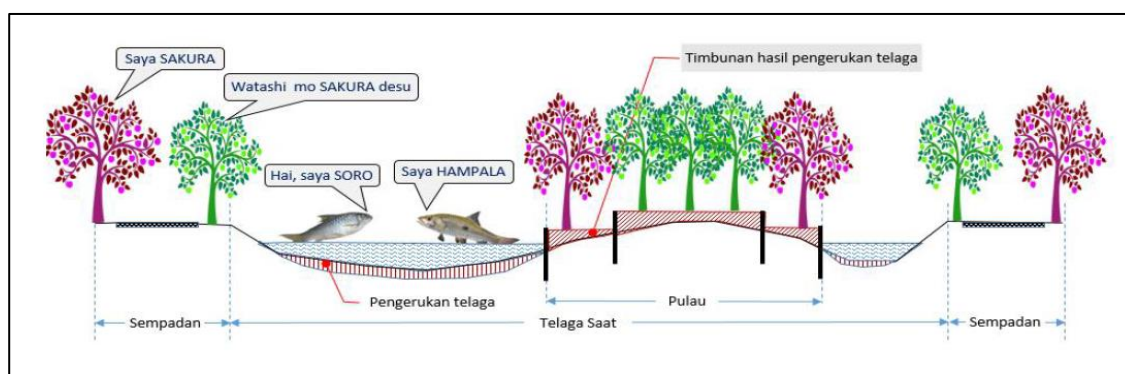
Proposed Cross Section Plan of Telaga Saat development project from JICA Project
